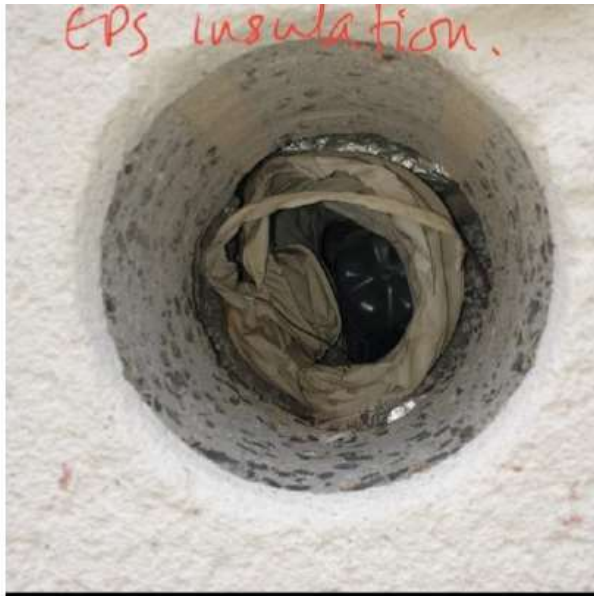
Vent hole in cavity wall showing no fire break or cavity barrier around penetration.
